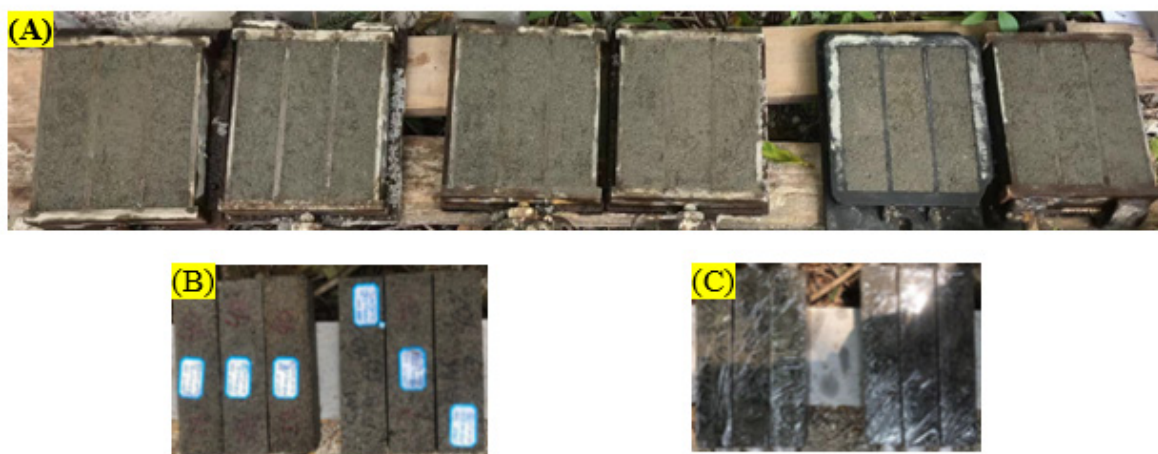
Experimental specimens (A) specimen casting (B) specimen labelling and; (C) specimen plaster covering.
